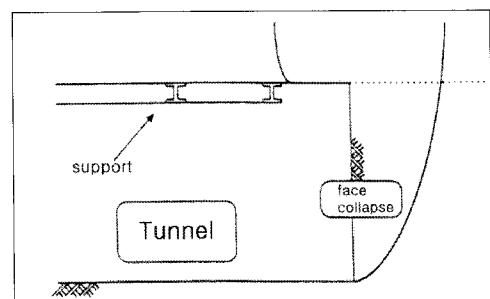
Collapse of the tunnel face after excavation in case of non-preloading and soft ground
